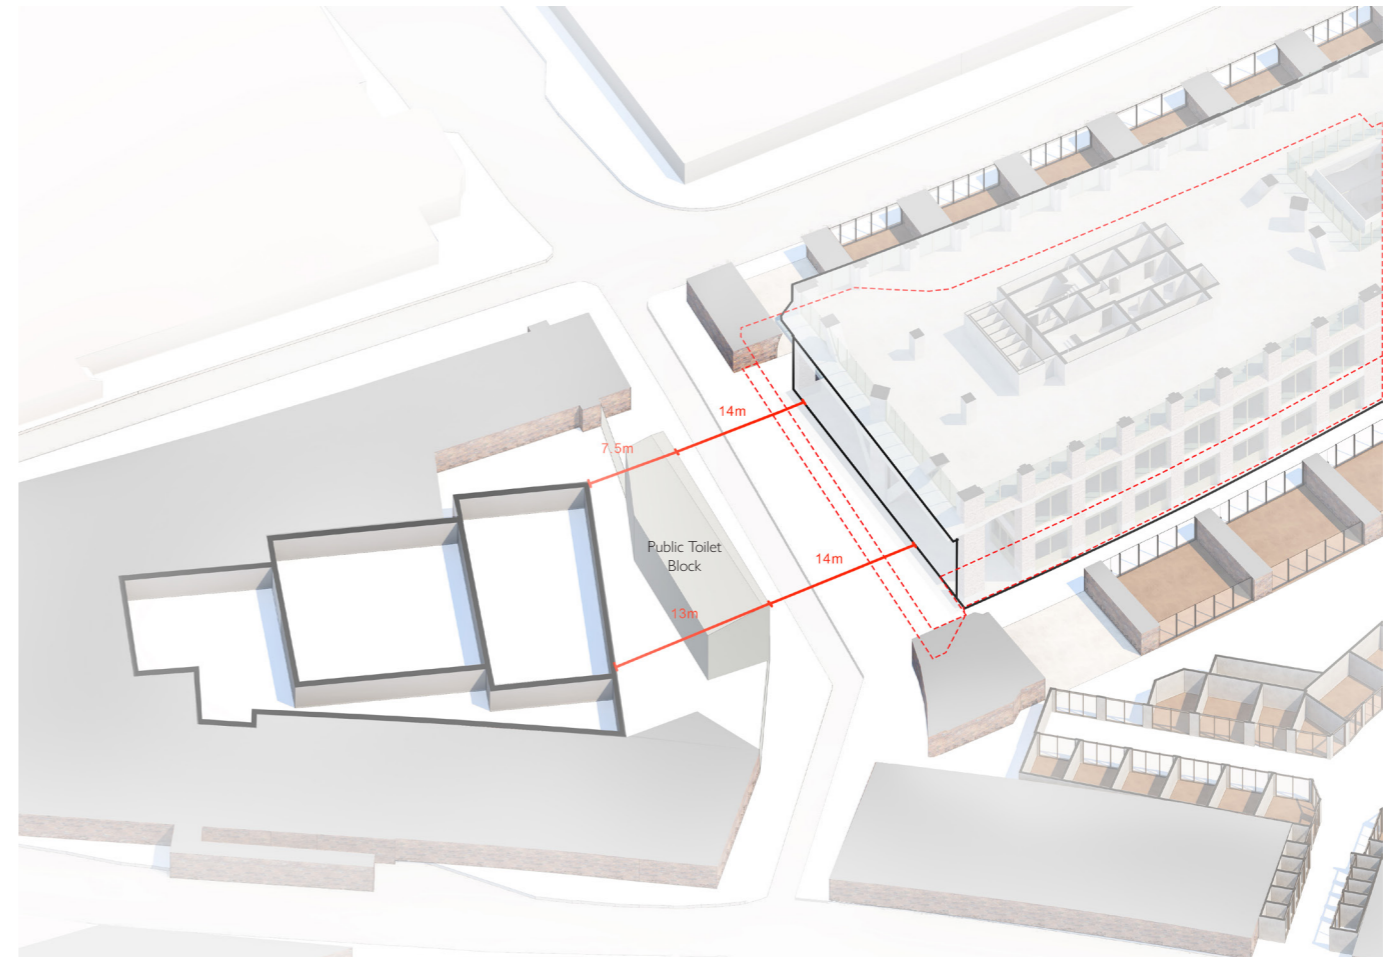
Proposed building frontage alignment diagram
